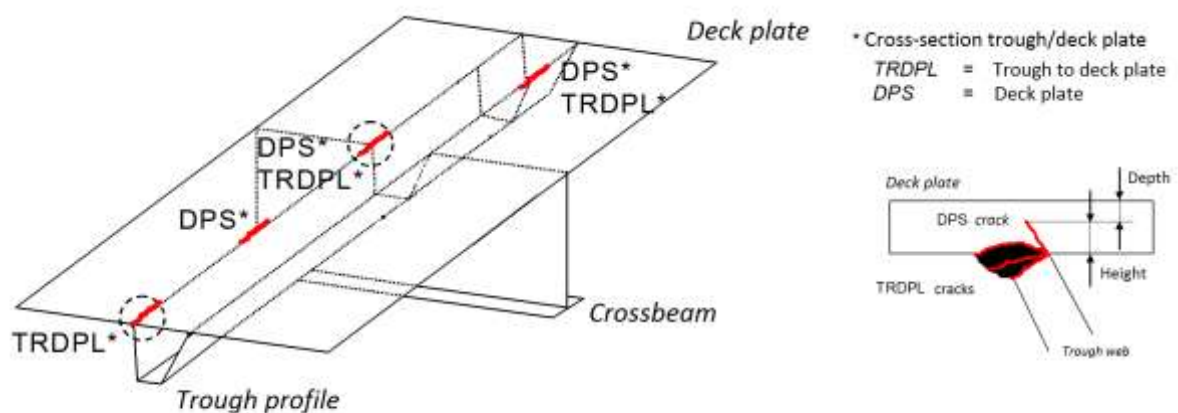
3d view of the bridge considered cracks' location (left); longitudinal cross-section with 'trough to deck plate' crack location (right);
